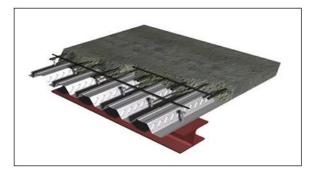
4: Cross-Section of Composite Floor Systems of Steel Framing (SADAT, 2014)
